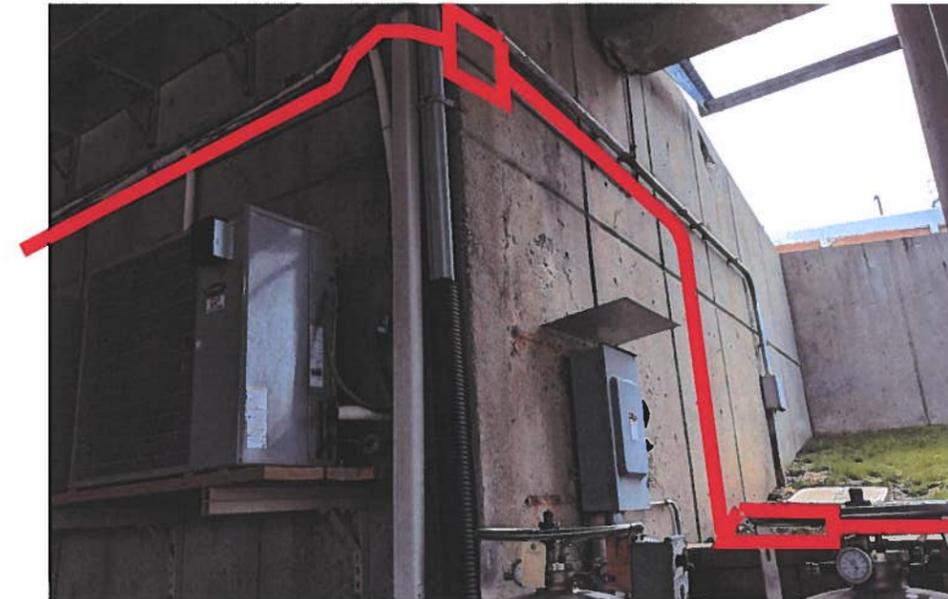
PROPOSED PATH FOR 2" EMT CONDUIT THROUGH PROPOSED SMALL PULLBOX FOR 90° BEND. (FACING EAST) - SECTION A-A AND SECTION B-B
